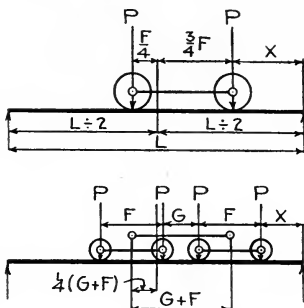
Position of Crane Truck for Maximum Moment in Runway Girder.
